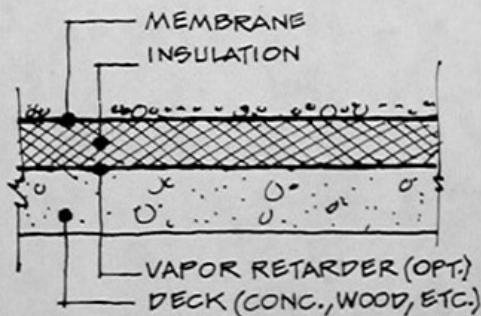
This common commercial roofing system sandwiches rigid insulation between the deck and roofing membrane. Such compact roofs have few condensation problems.
